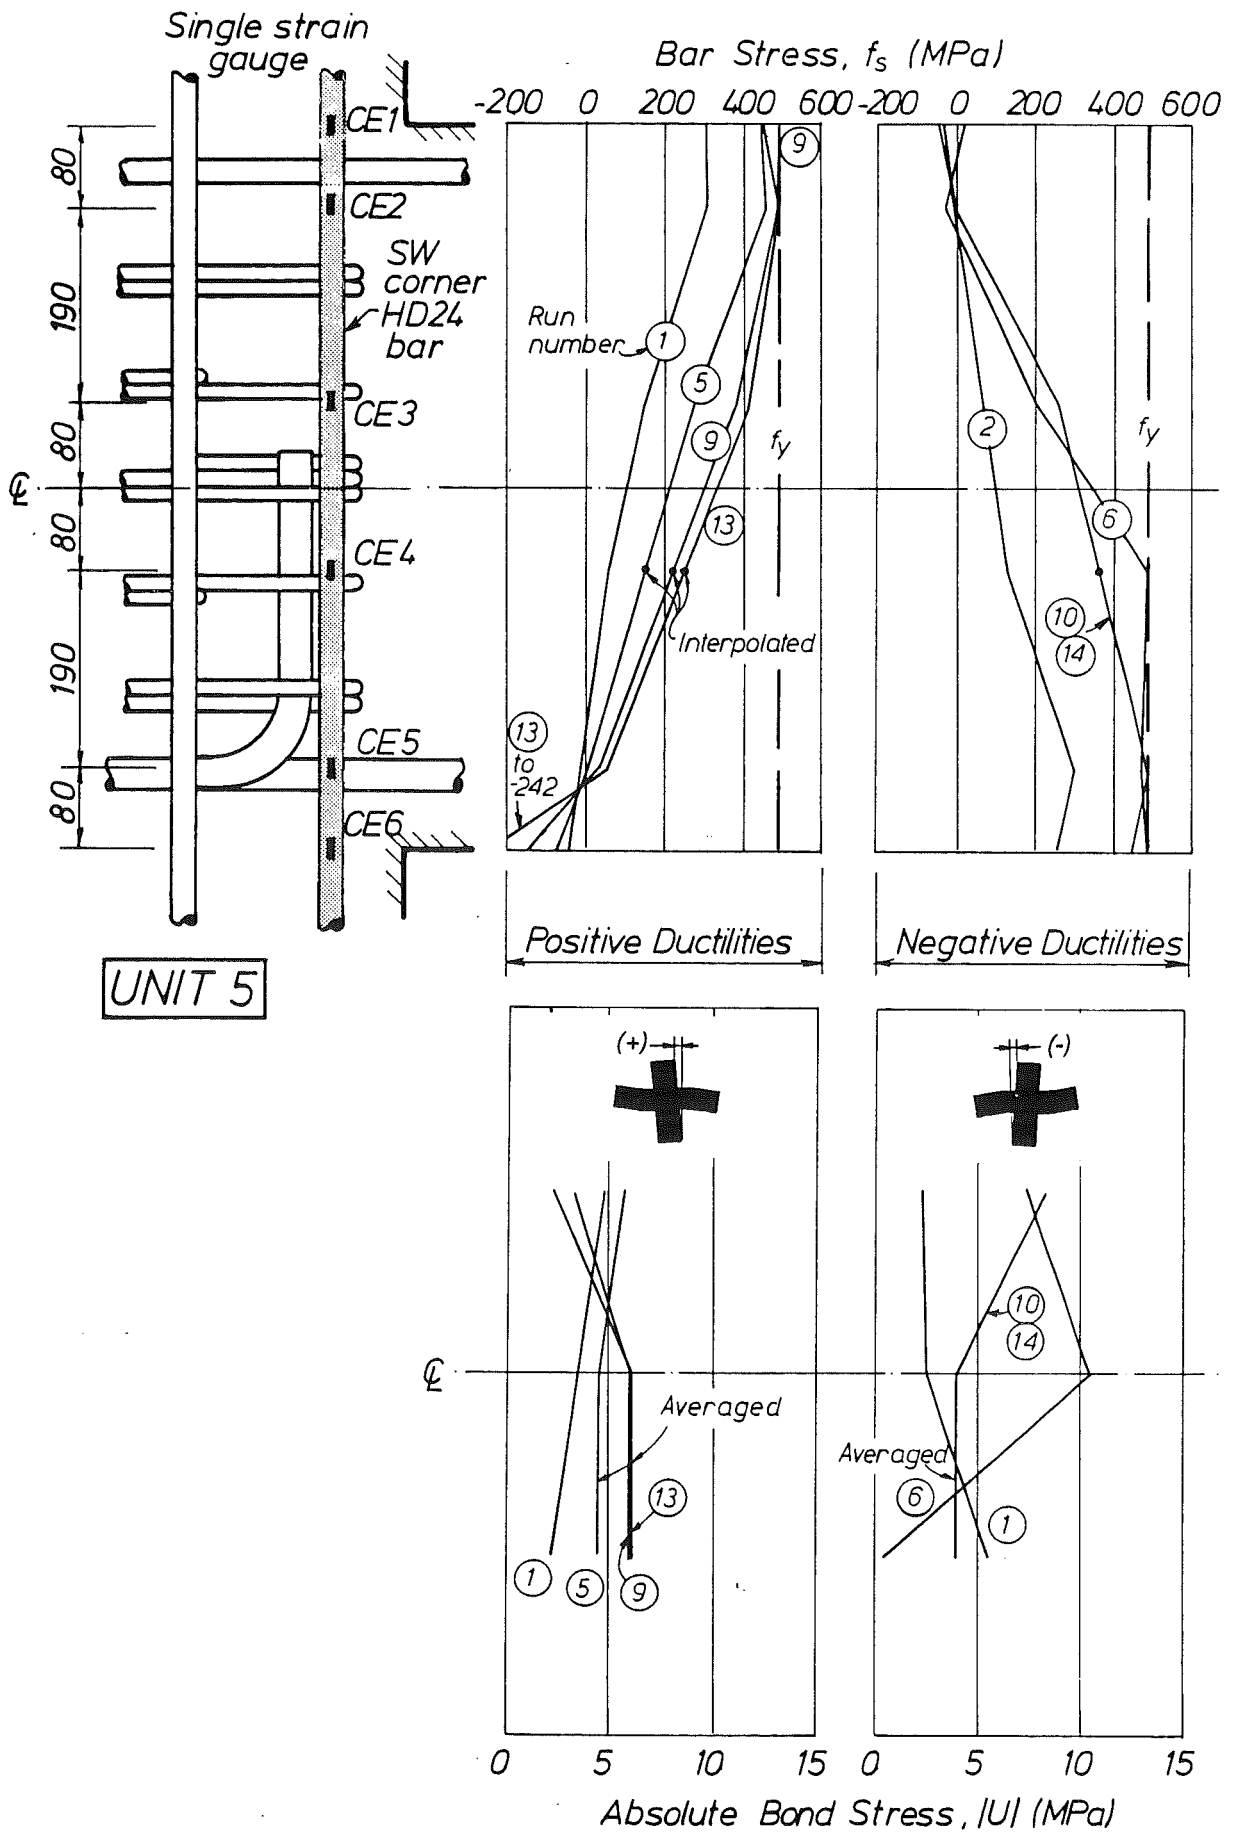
Bar and Bond Stresses - South-West Corner Column Bar of Unit 5.
